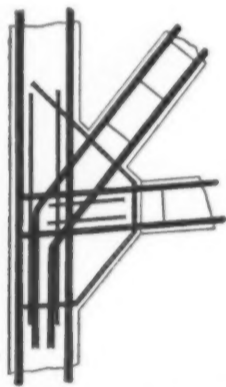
DISPOSITION OF ARMORING AT AA, FIG. 1.
